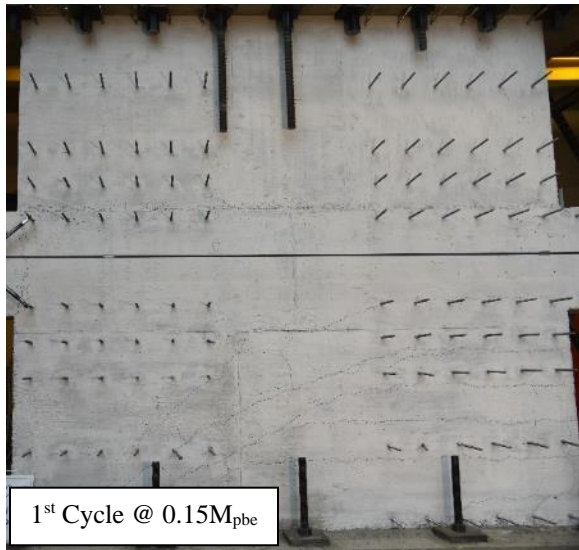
Wall Damage Photos for SRC-W3
